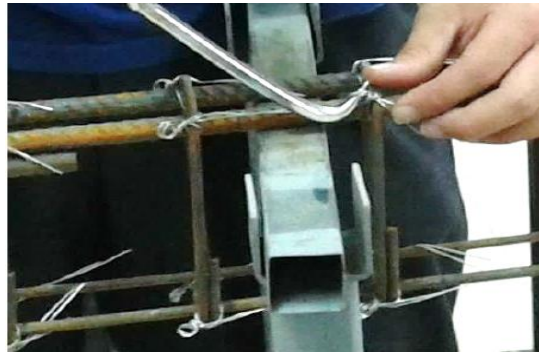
Tying of Reinforcement in Conjoining Main Reinforcement and Shear Links
